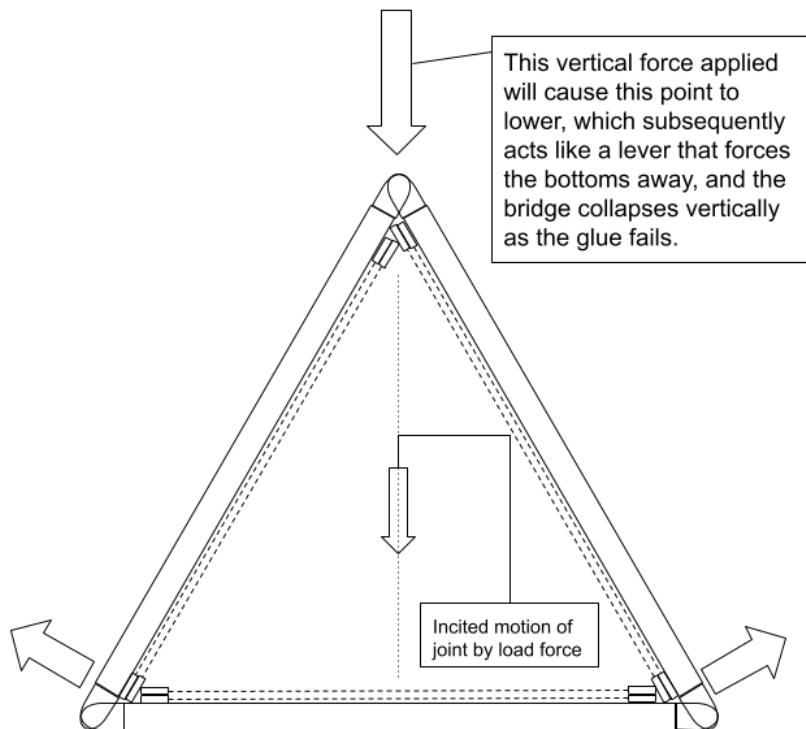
Forces in the triangle bridge that caused its failure.
